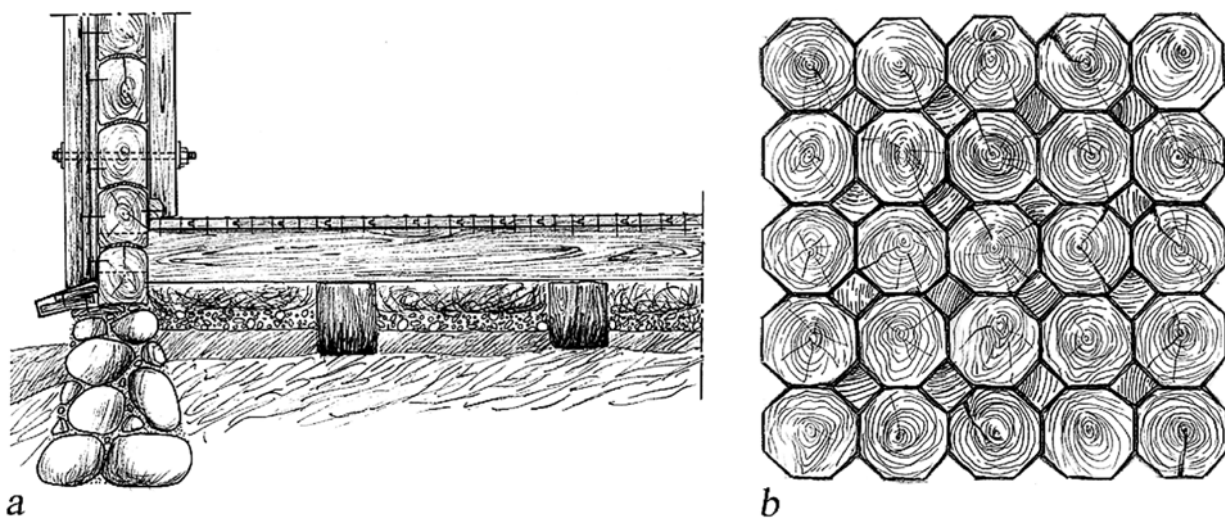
Flooring types; a – section of paving construction, made of the wooden boards, b – flooring made of sectioned logs (designed by L. Berežanskyté)
